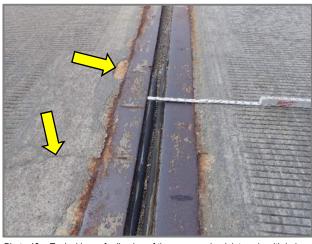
Typical loss of adhesion of the compression joint seals with bulges and depressions (looking south at the Pier 7 joint in the westbound lanes). Note the minor spalls and longitudinal hairline crack in the joint header.
